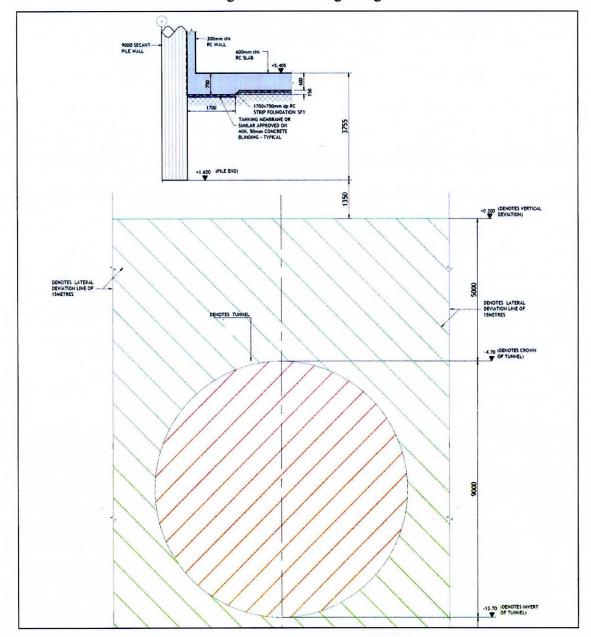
Profile of tunnel, basement and secant pile wall at the Aurthur Cox Building
